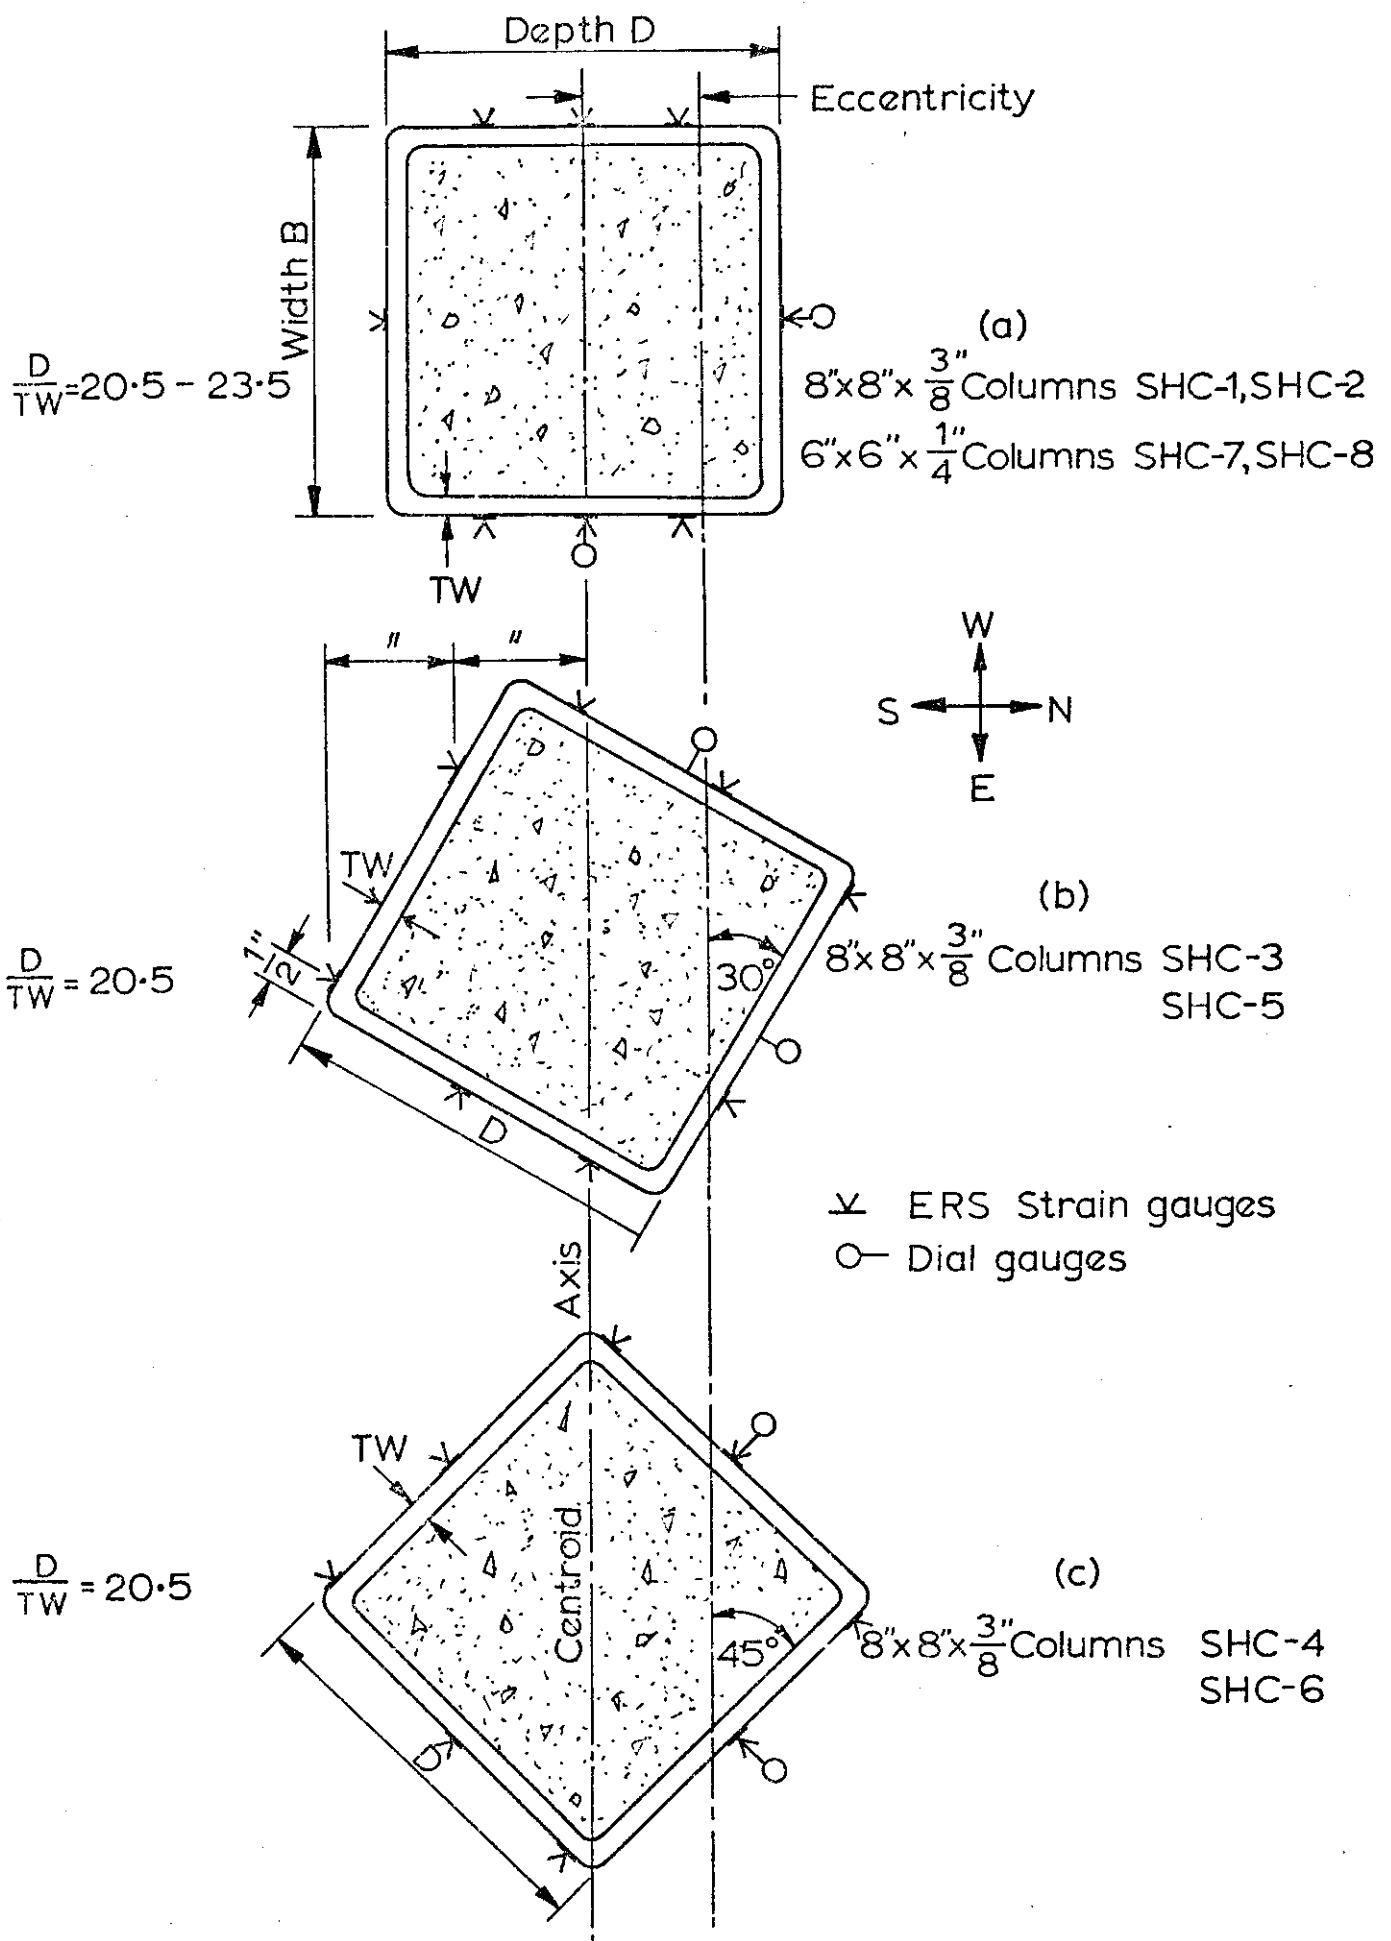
CROSS SECTIONAL AND LOADING DETAILS FOR CONCRETE FILLED SQUARE TUBES, SHC COLUMN SERIES.
